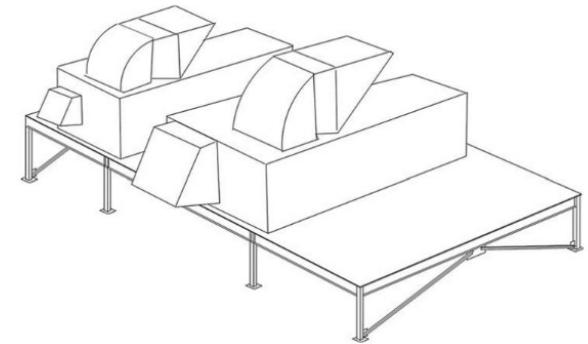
Example of an equipment support platform supporting two mechanical components.
